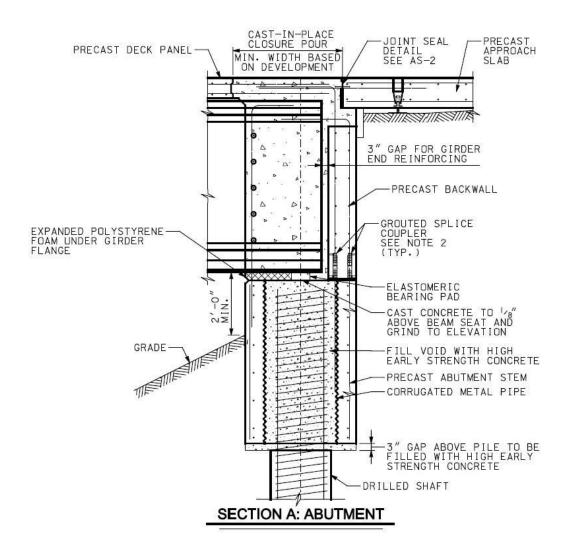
Typical Section Through Abutment (source: Utah DOT Standards)
